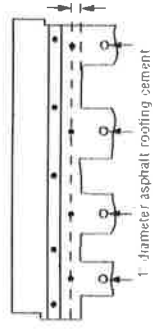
Fastening Presidential and Presidential TL Shake shingles on steep slopes.
